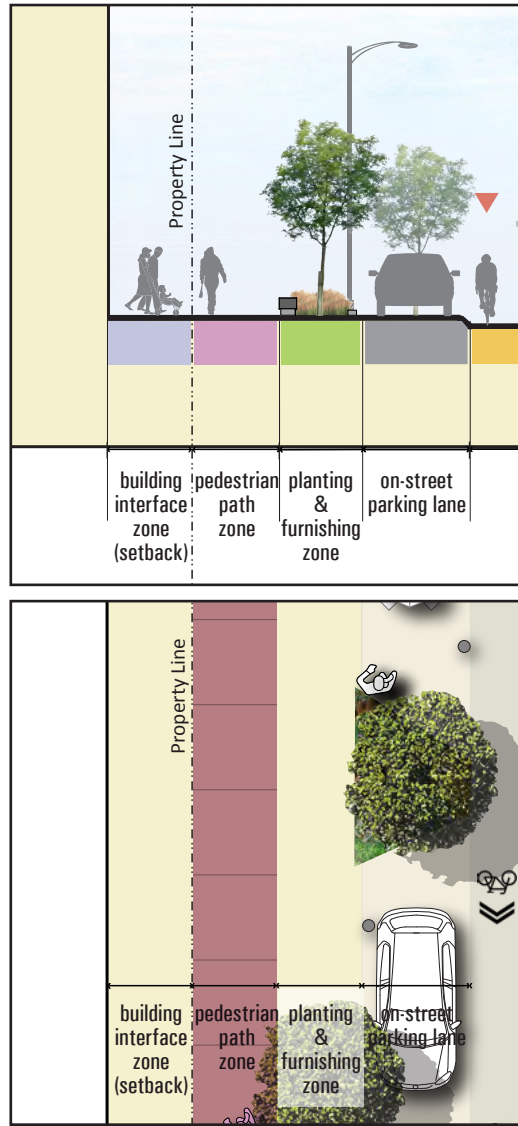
Cross Avenue & Davis Road streetscape (Alternative)
